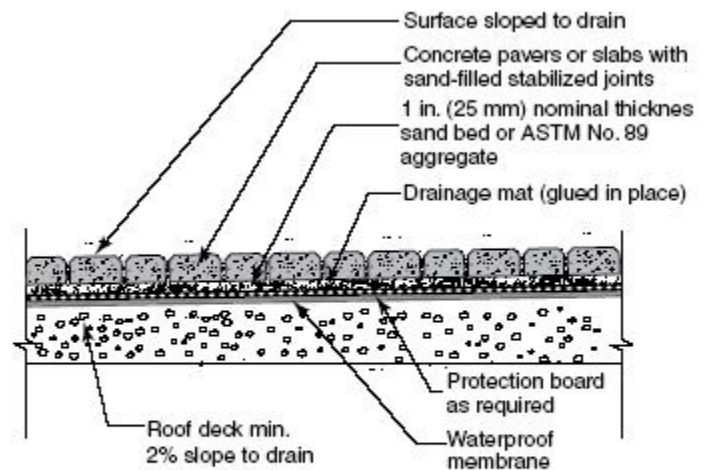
Sand-set concrete pavers or slabs for a pedestrian roof plaza deck. Units no larger than 12 x 12 in. (300 x 300 mm) length and width are recommended for sand-set applications to avoid tipping.
